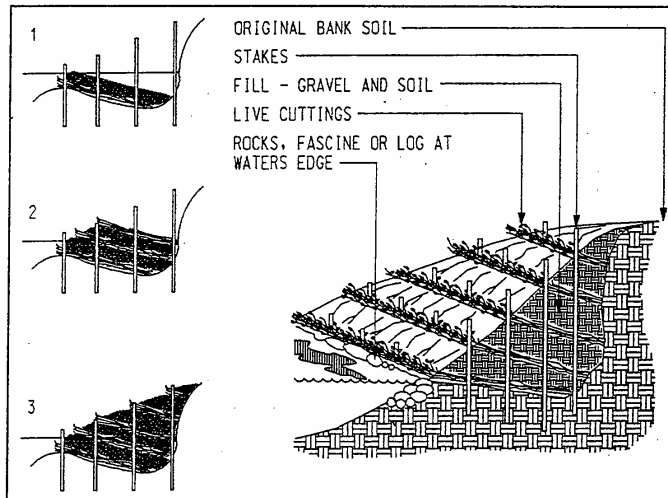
Installation of Branch Packings (Source: CBBEL Files)
